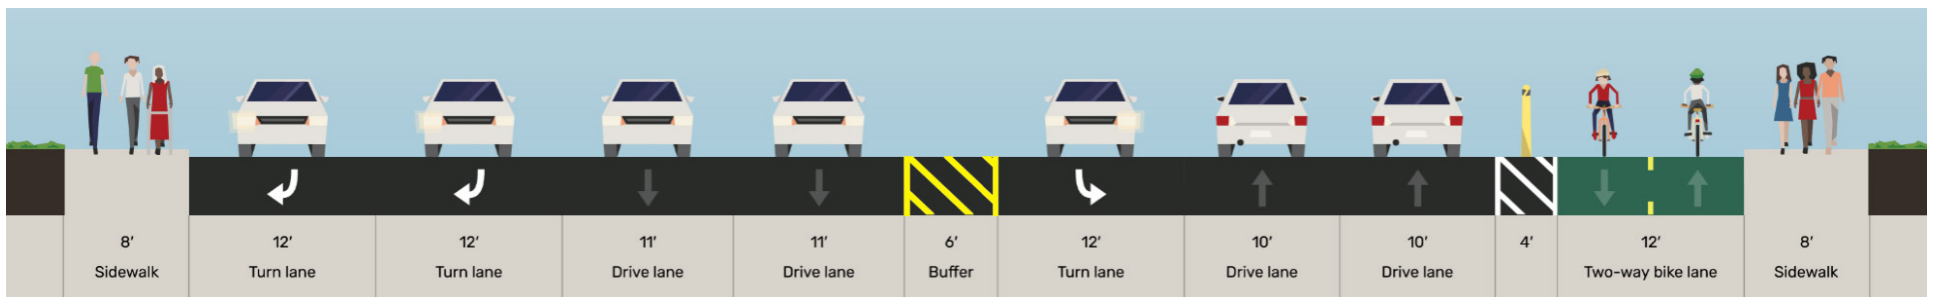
Proposed cross-section: W 120th St from Crenshaw Blvd to the Laguna Dominguez Trail
